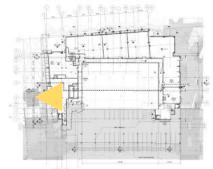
| AGi32 Greyscale - Elevation View of Entertainment Lounge
